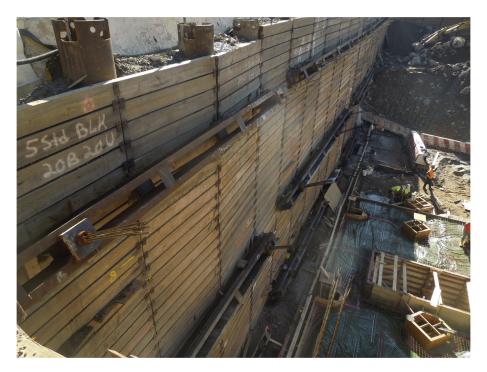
Timber lagging, horizontal wales and soil anchors are shown. Wales are slanted so that the face plate of the soil anchor can seat on the wale properly.
